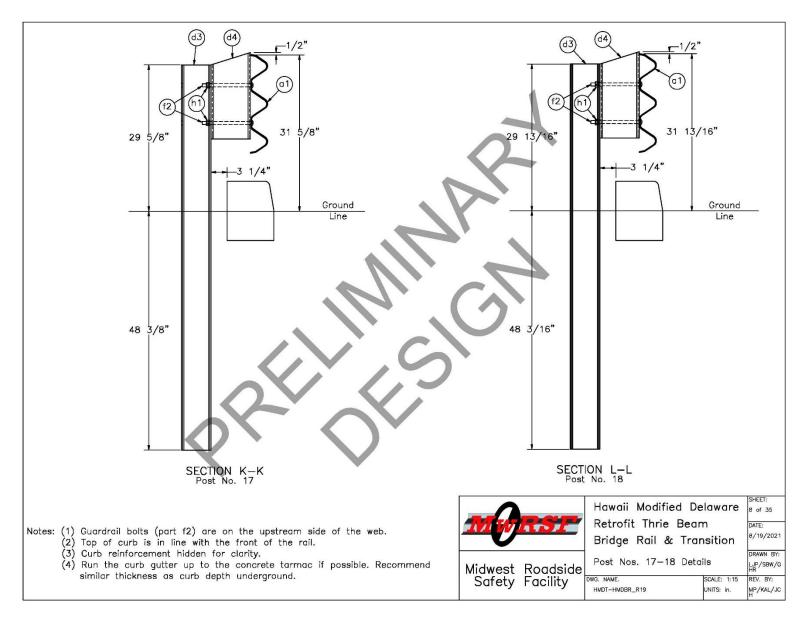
Post Nos. 17 and 18 Details, Test No. HMDT-1
